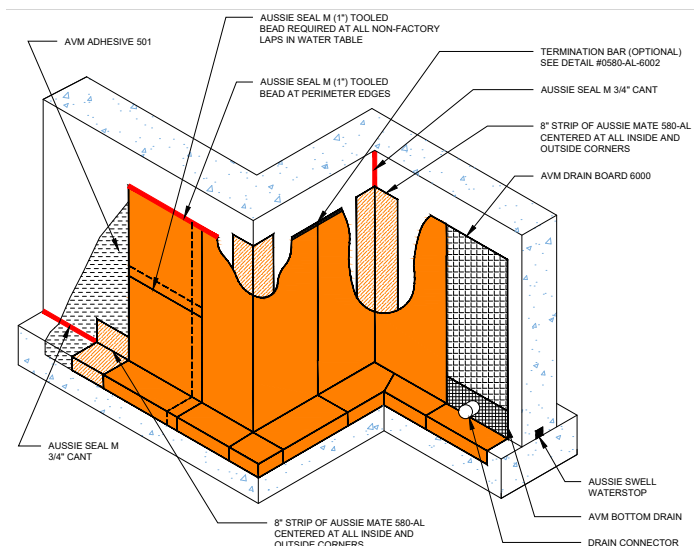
STANDARD INSIDE, OUTSIDE & FOOTING DETAILING
